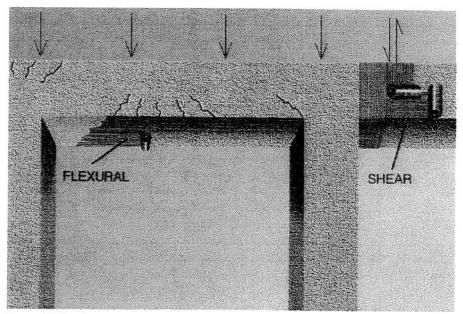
G CONCRETE BEAM RETROFIT FOR FLEXURE AND SHEAR LOADING
